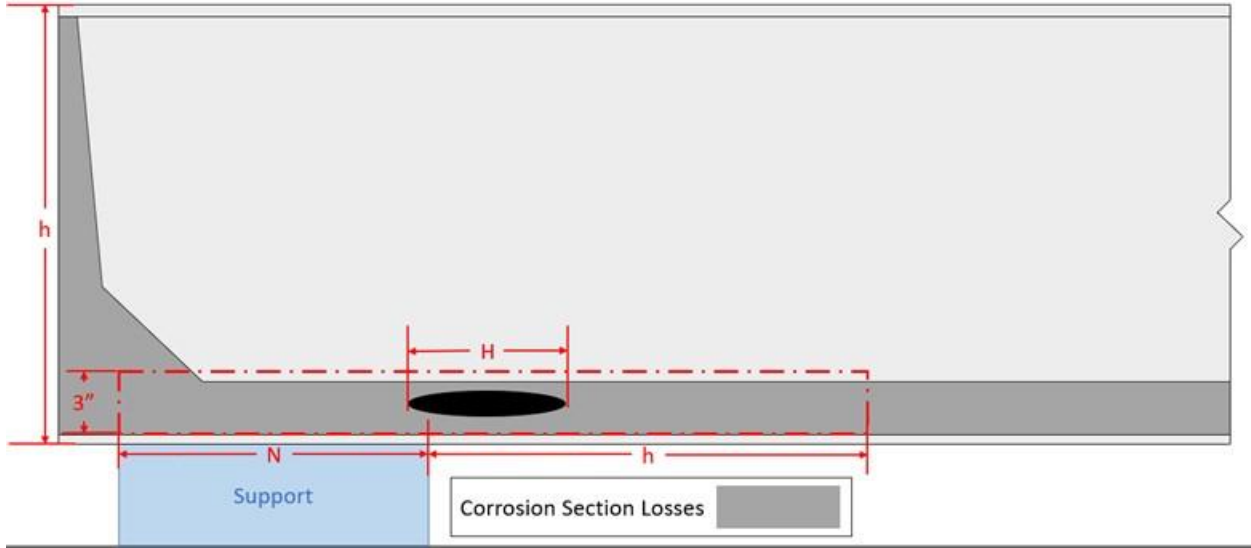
Critical Dimensions Used for Load Rating Corroded Steel Beams
